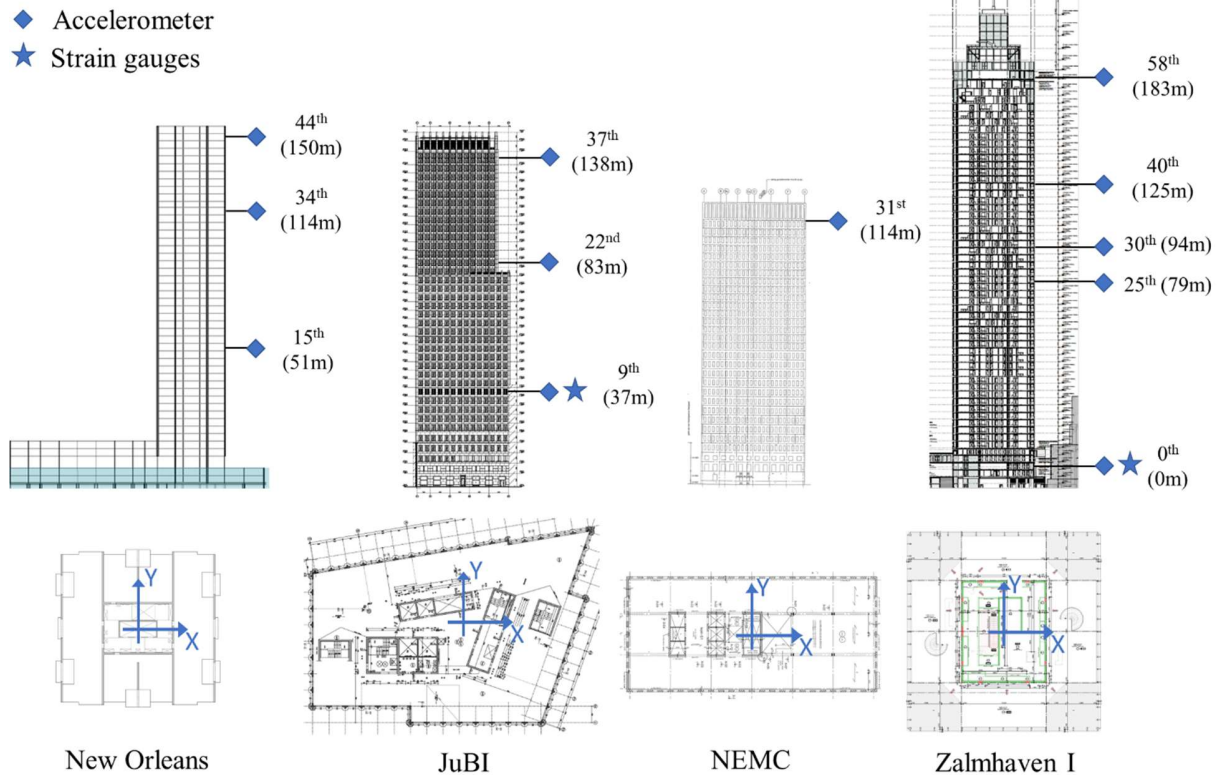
Side views and cross sections of the studied buildings indicating the instrumented floors and the building axis system.
